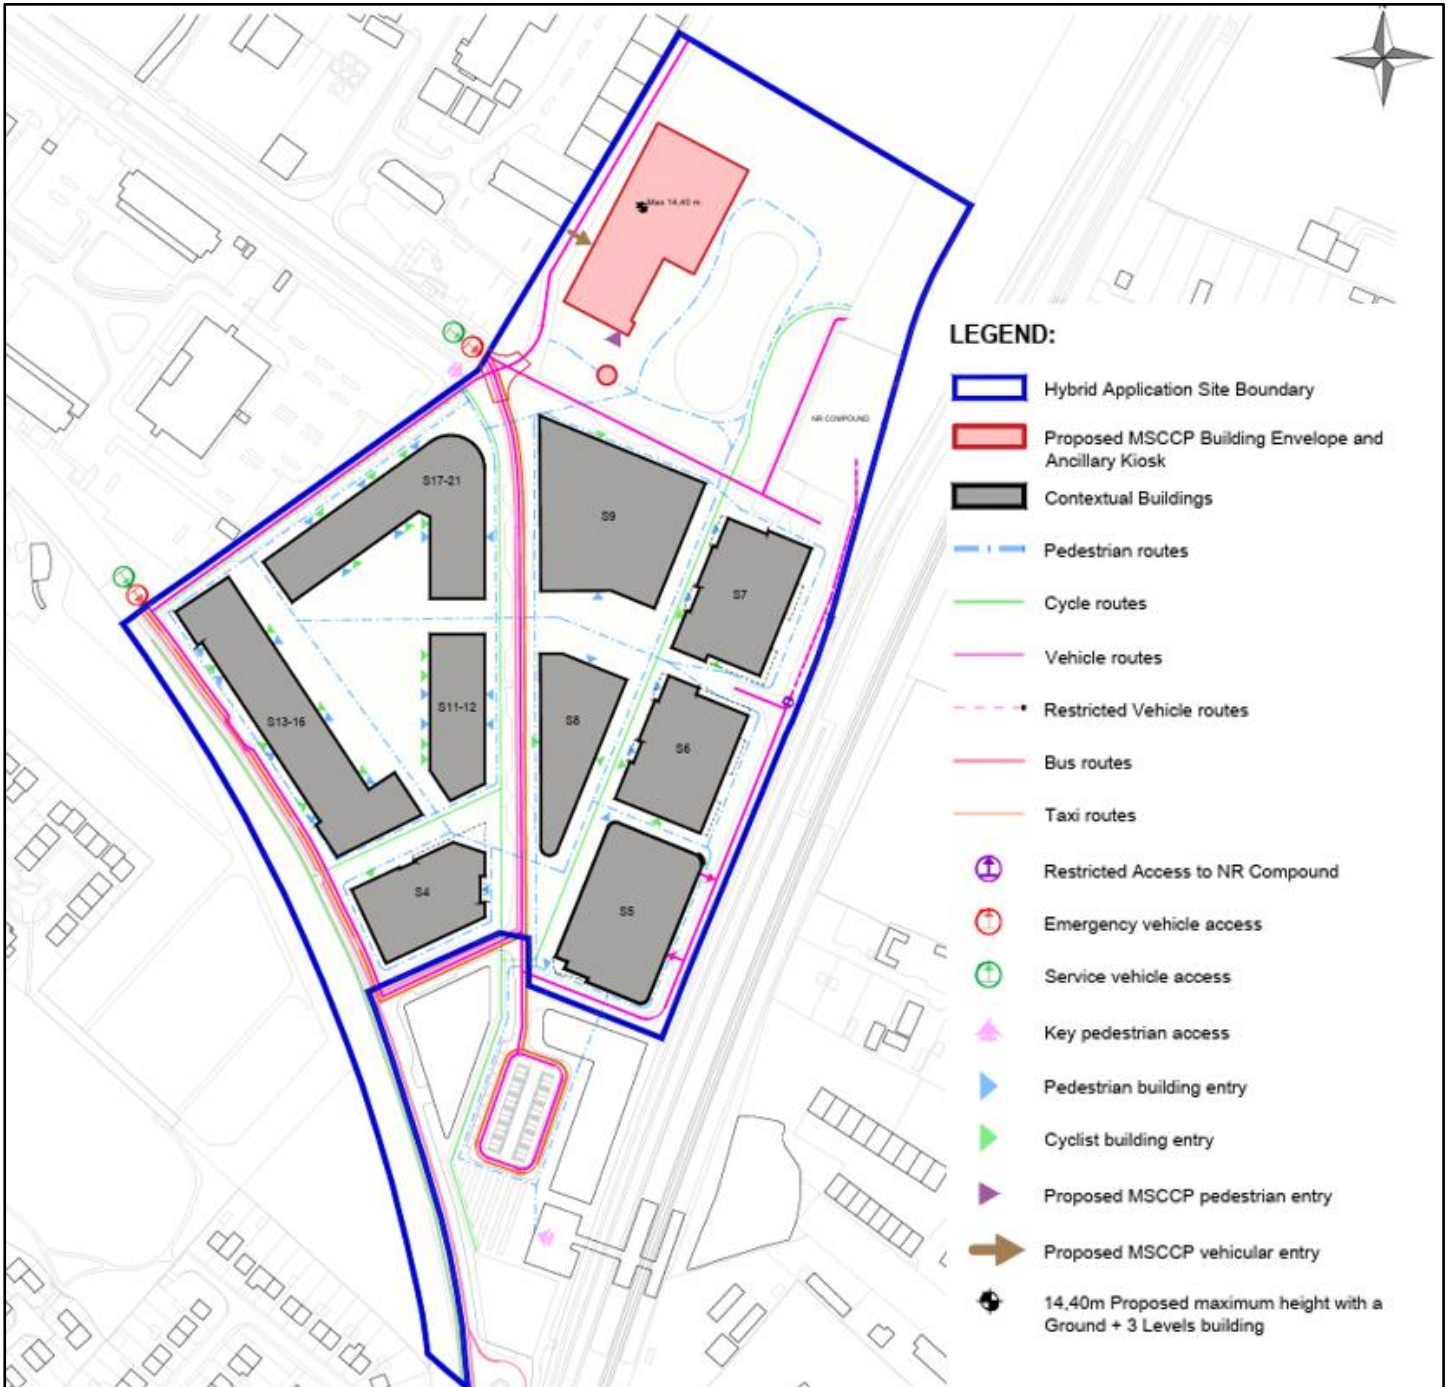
Application Site Location & Relationship with 'Approved' Cambridge North Masterplan Boundary Area (Source, Stripe 2026).
